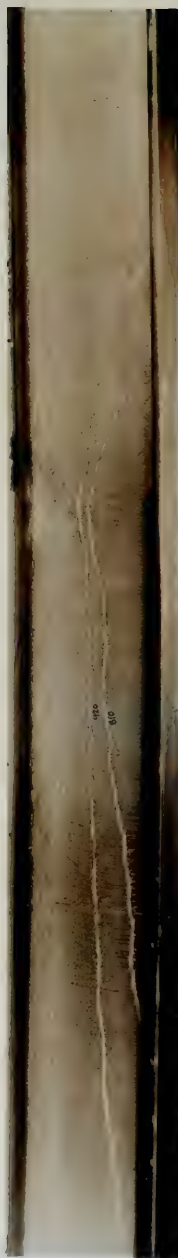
" Aluminum Beam with Typical Stresscoat Crack Pattern.
